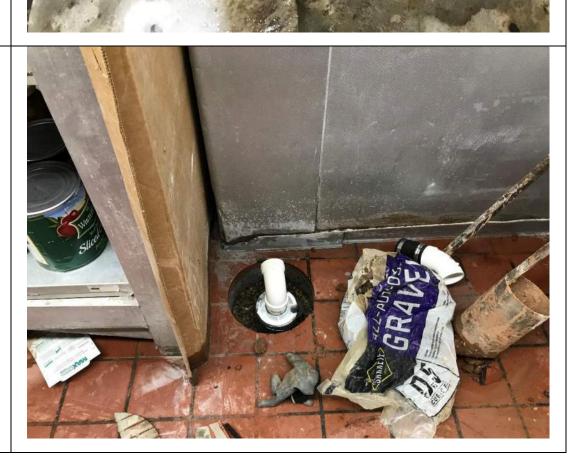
View of subsurface conditions below the slab at vapor extraction point VEP-18, facing southwest.
